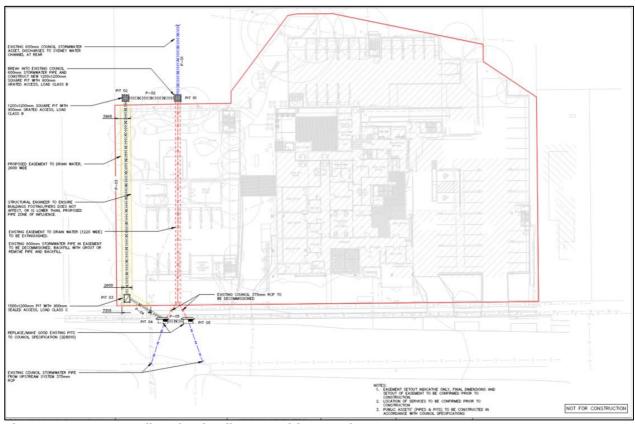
Stormwater diversion (Stellen Consulting 2021)
